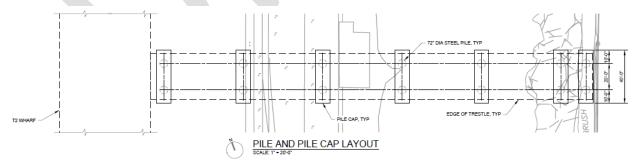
Pile Layout for T2 Access Trestles: Alternative 2A with 72-inch-diameter Driven Piles
